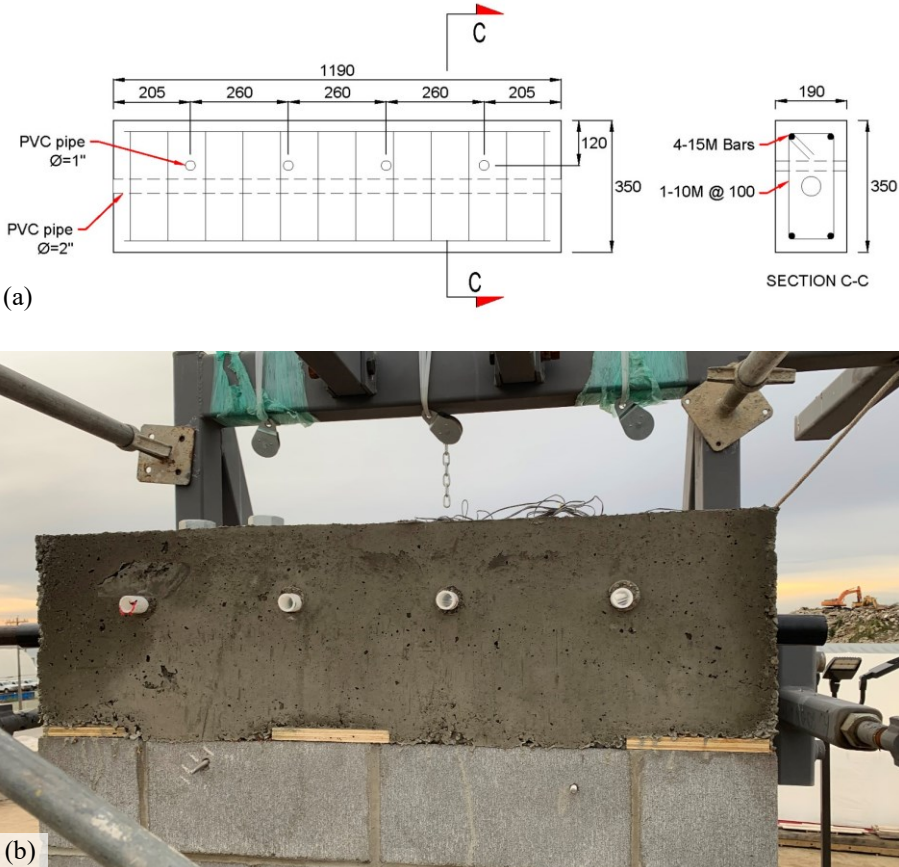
Concrete beam at the top of the RM Wall (a) Schematic drawing (b) After removing formwork.
